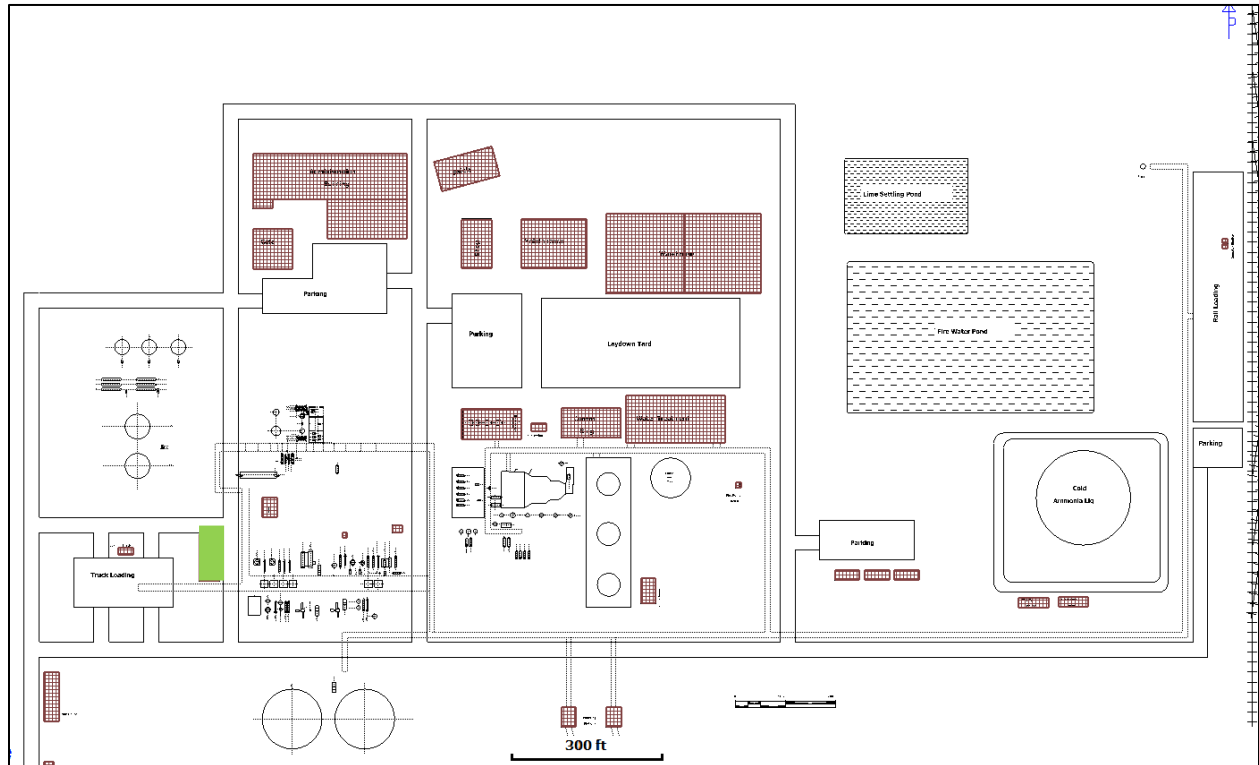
Facility Plant Plot Plan (Building Location Shown in Green)
